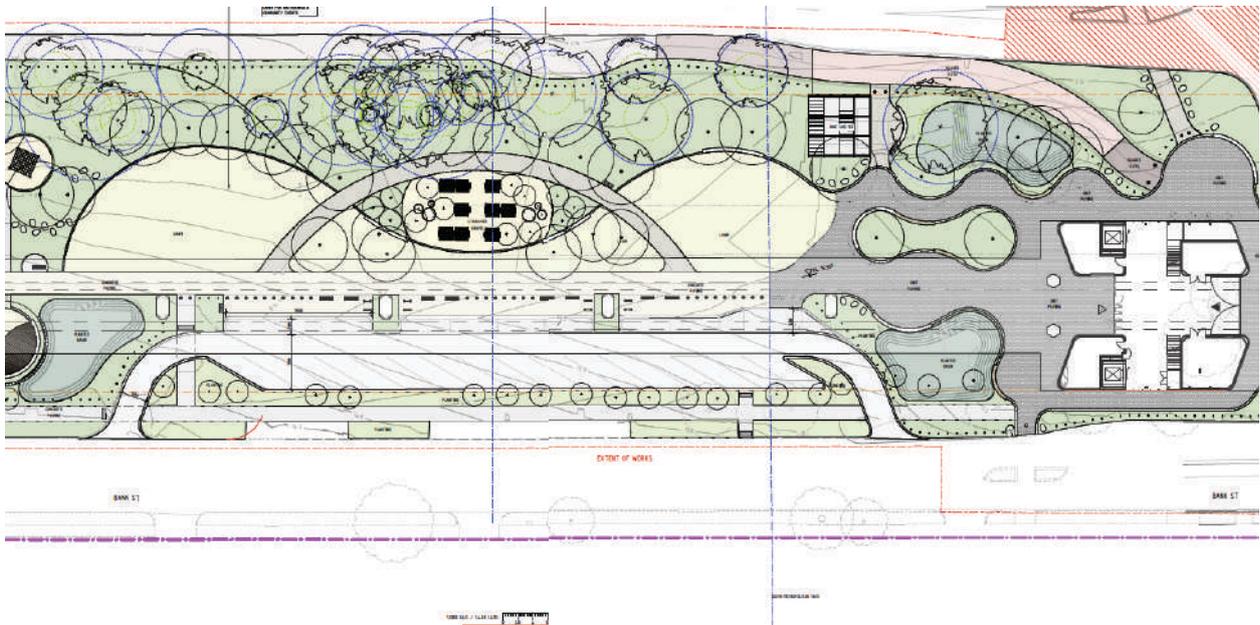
Proposed Northern Oats Street Train Station Parking Facilities Including Staff Parking, Loading Bays and Kiss 'n' Ride Facilities
